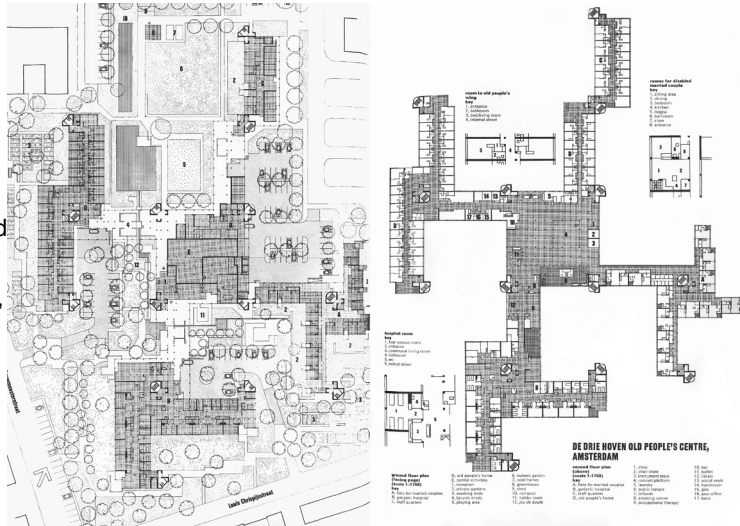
Herman Hertzberger, De Drie Hoven, groundfloor and second floor plan. Photo: Willem Diepraam
